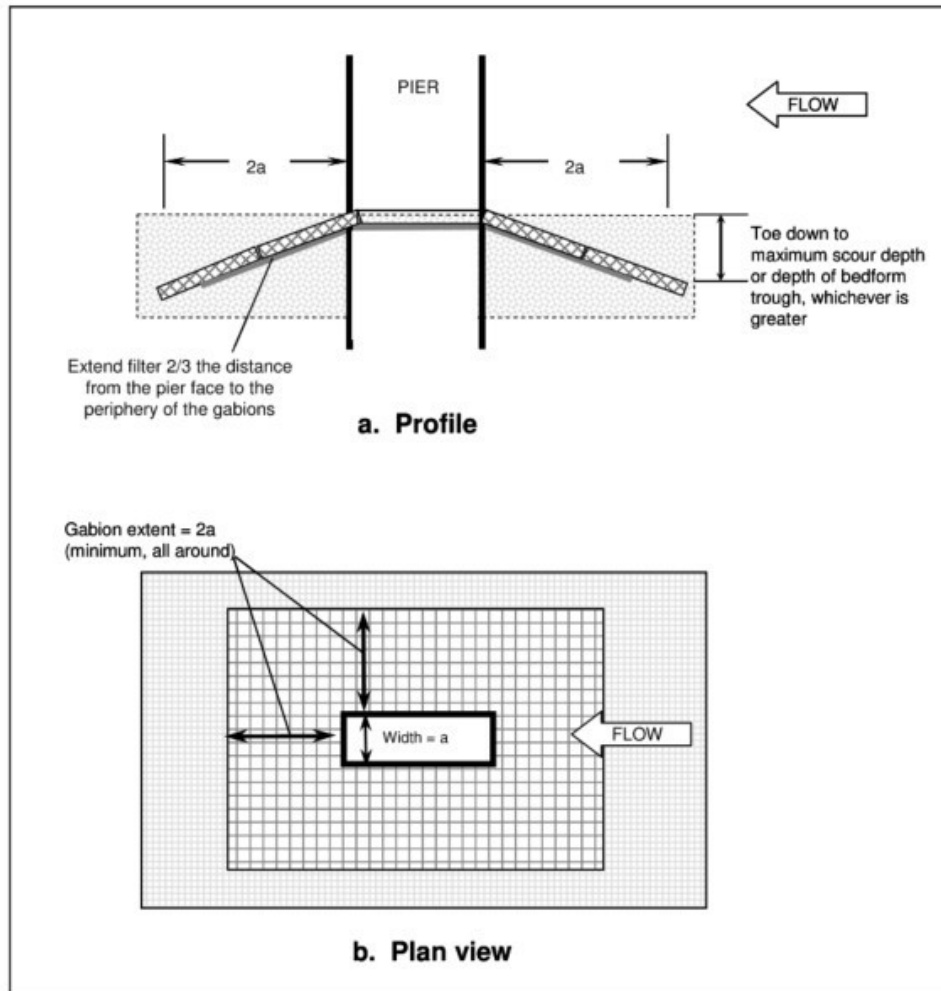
Gabion mattress layout diagram for pier scour countermeasures.
